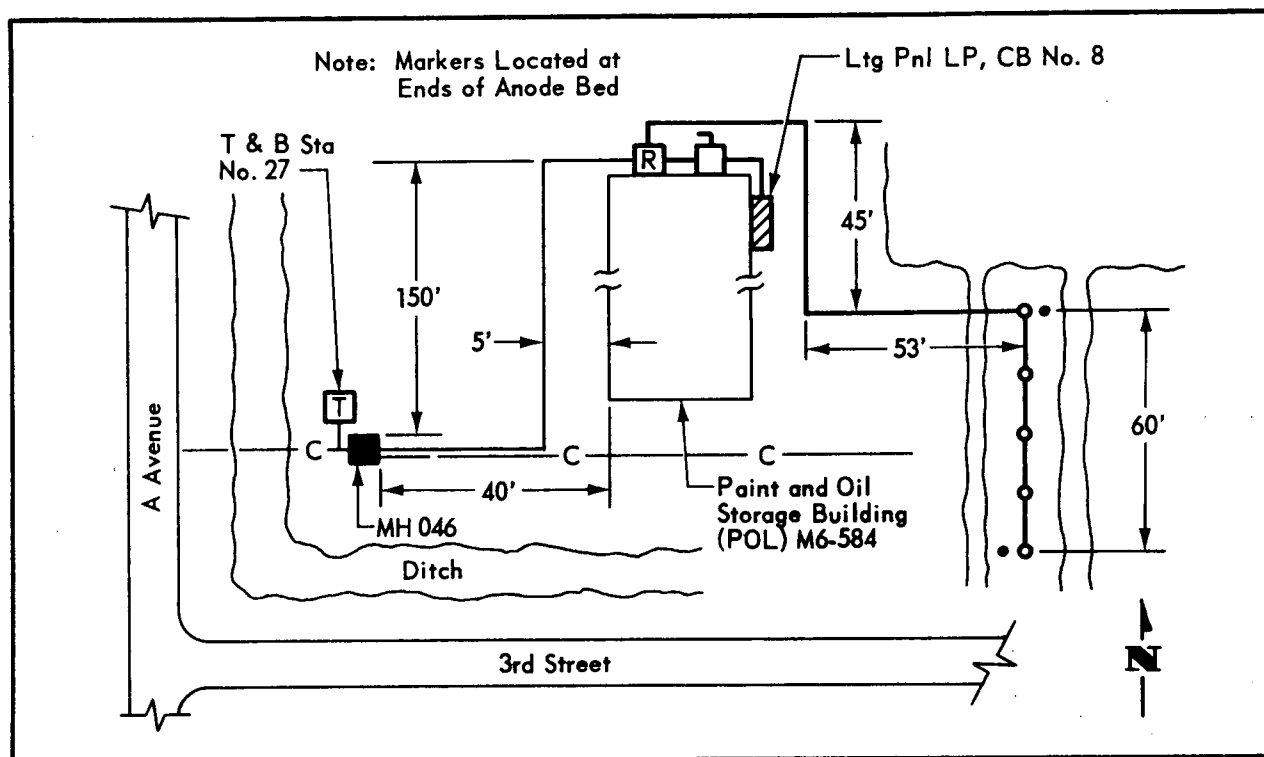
Site No. 32 and Test and Bond Station No. 27 Equipment Locator
